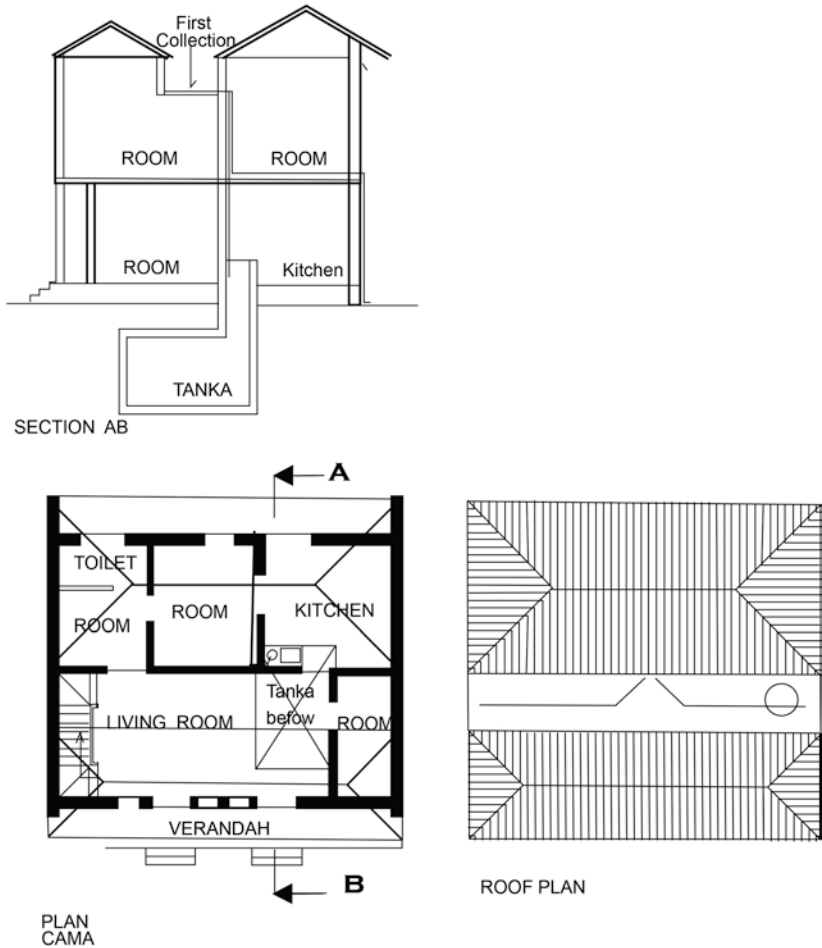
Cut section and plan of the Cama House, Bharuch vad, depicting the position of the *tanka*. Drawing by Prof. Kavaz Kapadia. Parzor Archives
